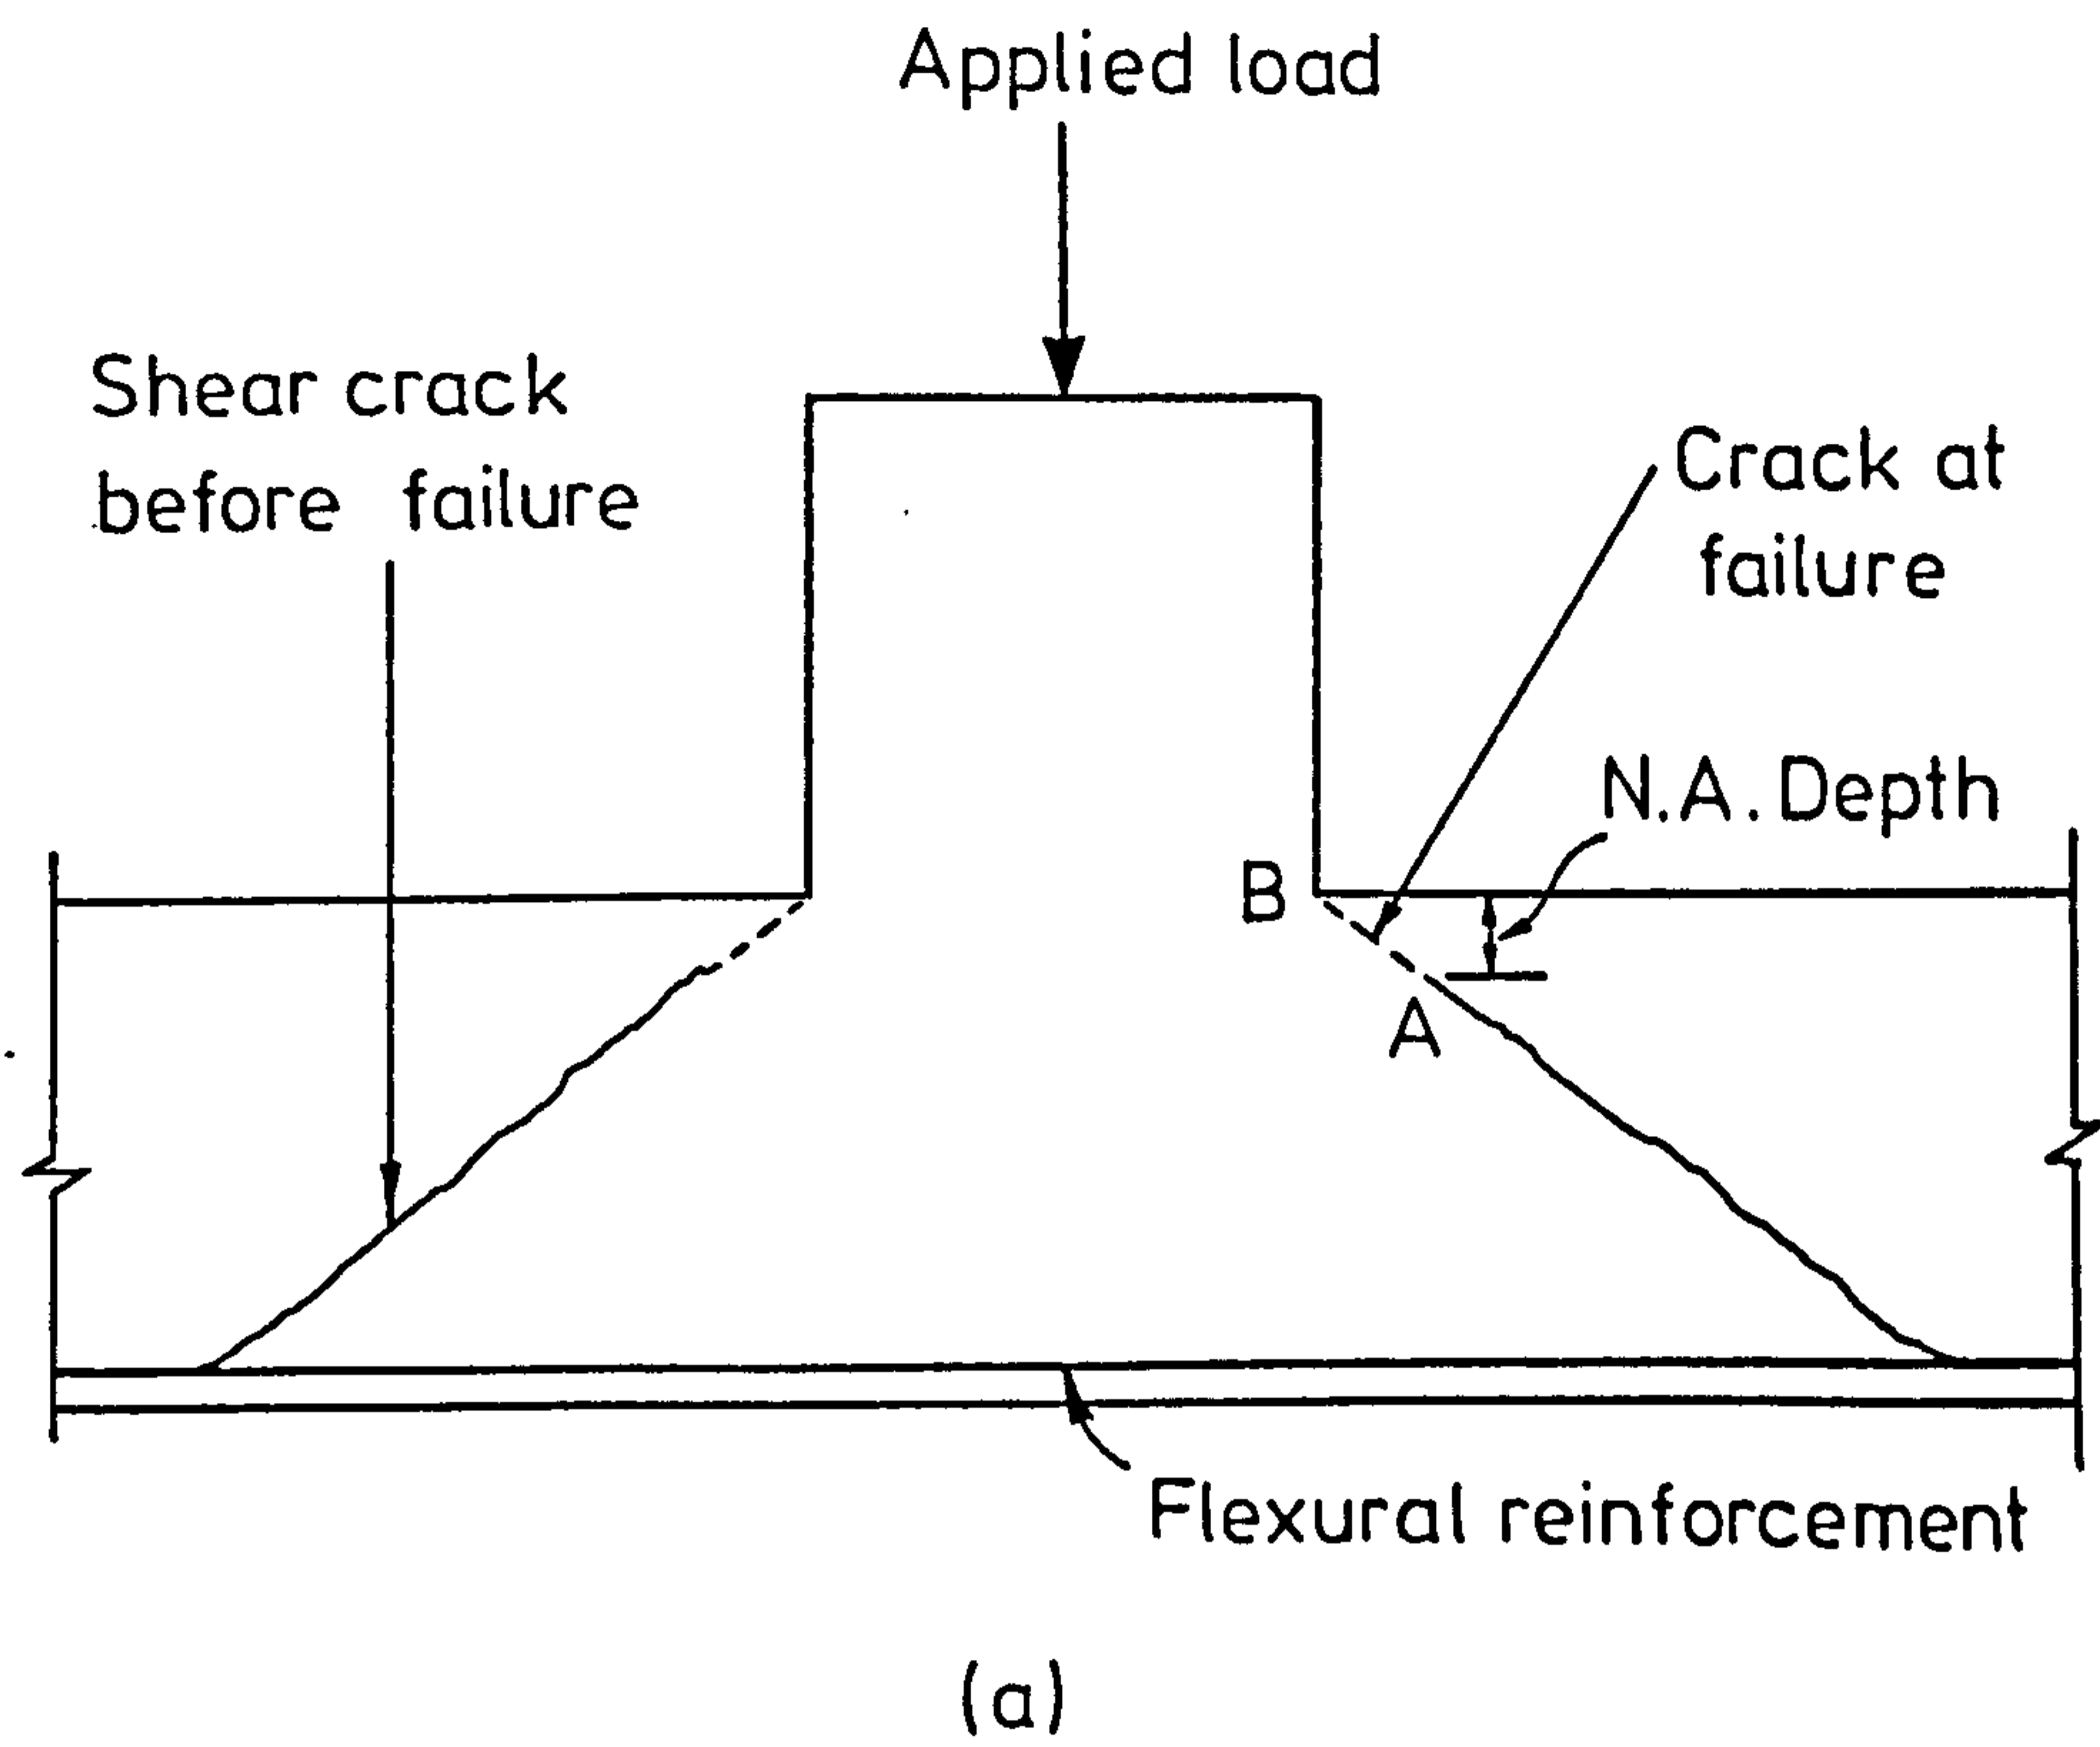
CONDITIONS AFTER INCLINED CRACKING IN A PLAIN CONCRETE SLAB
